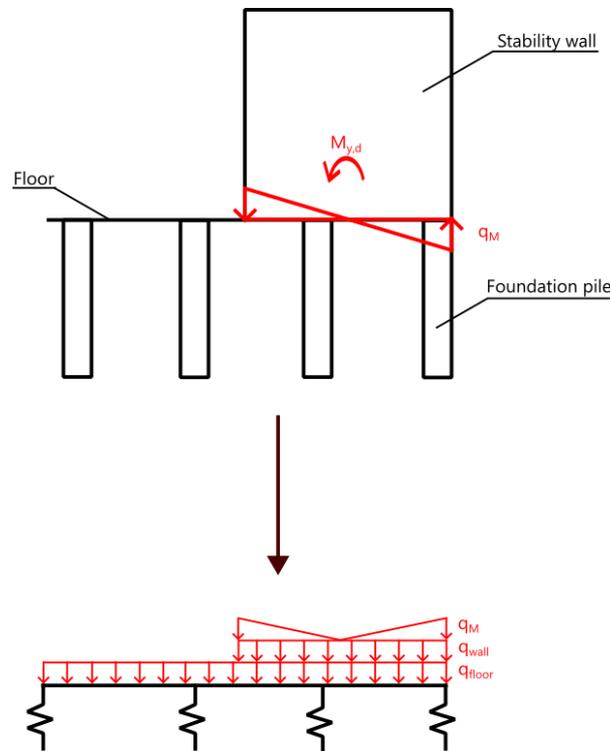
How to Model Moment due to Wind Loads on Stability Walls
